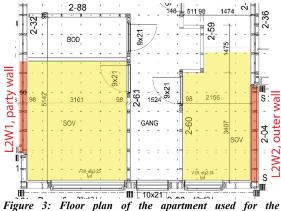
Floor plan of the apartment used for the measurements at location 2. The investigated walls L2W1 and L2W2 are highlighted.
